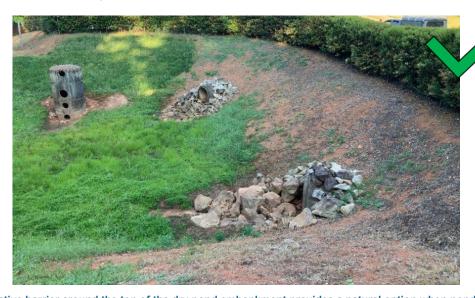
Vegetative barrier around the top of the dry pond embankment provides a natural option when pond barriers are required for safety
